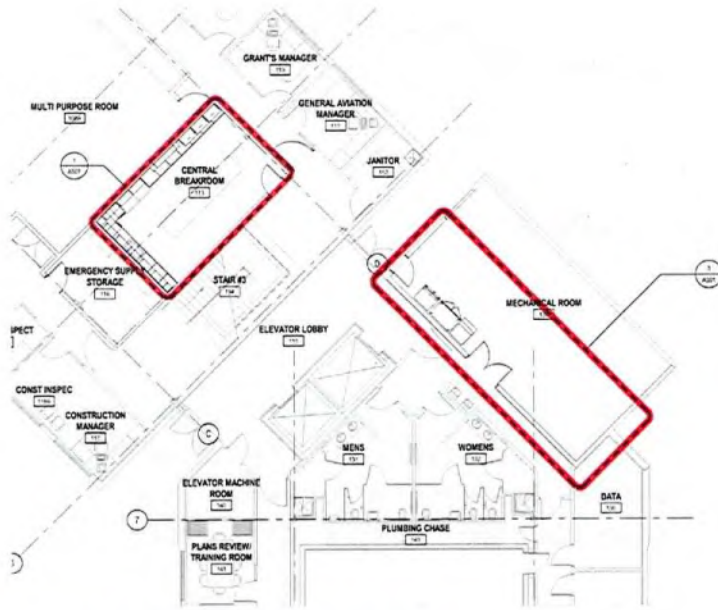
BUILDING 846- FIRST LEVEL FLOOR PLAN
